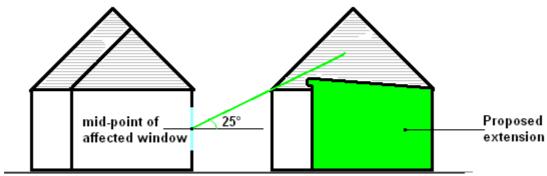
Fig B: Proposed extension would not result in loss of daylight to adjacent window of a habitable room
